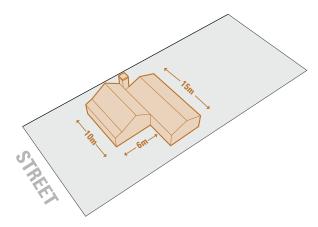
New building that is sited according to preferred maximum wall length and setbacks.
